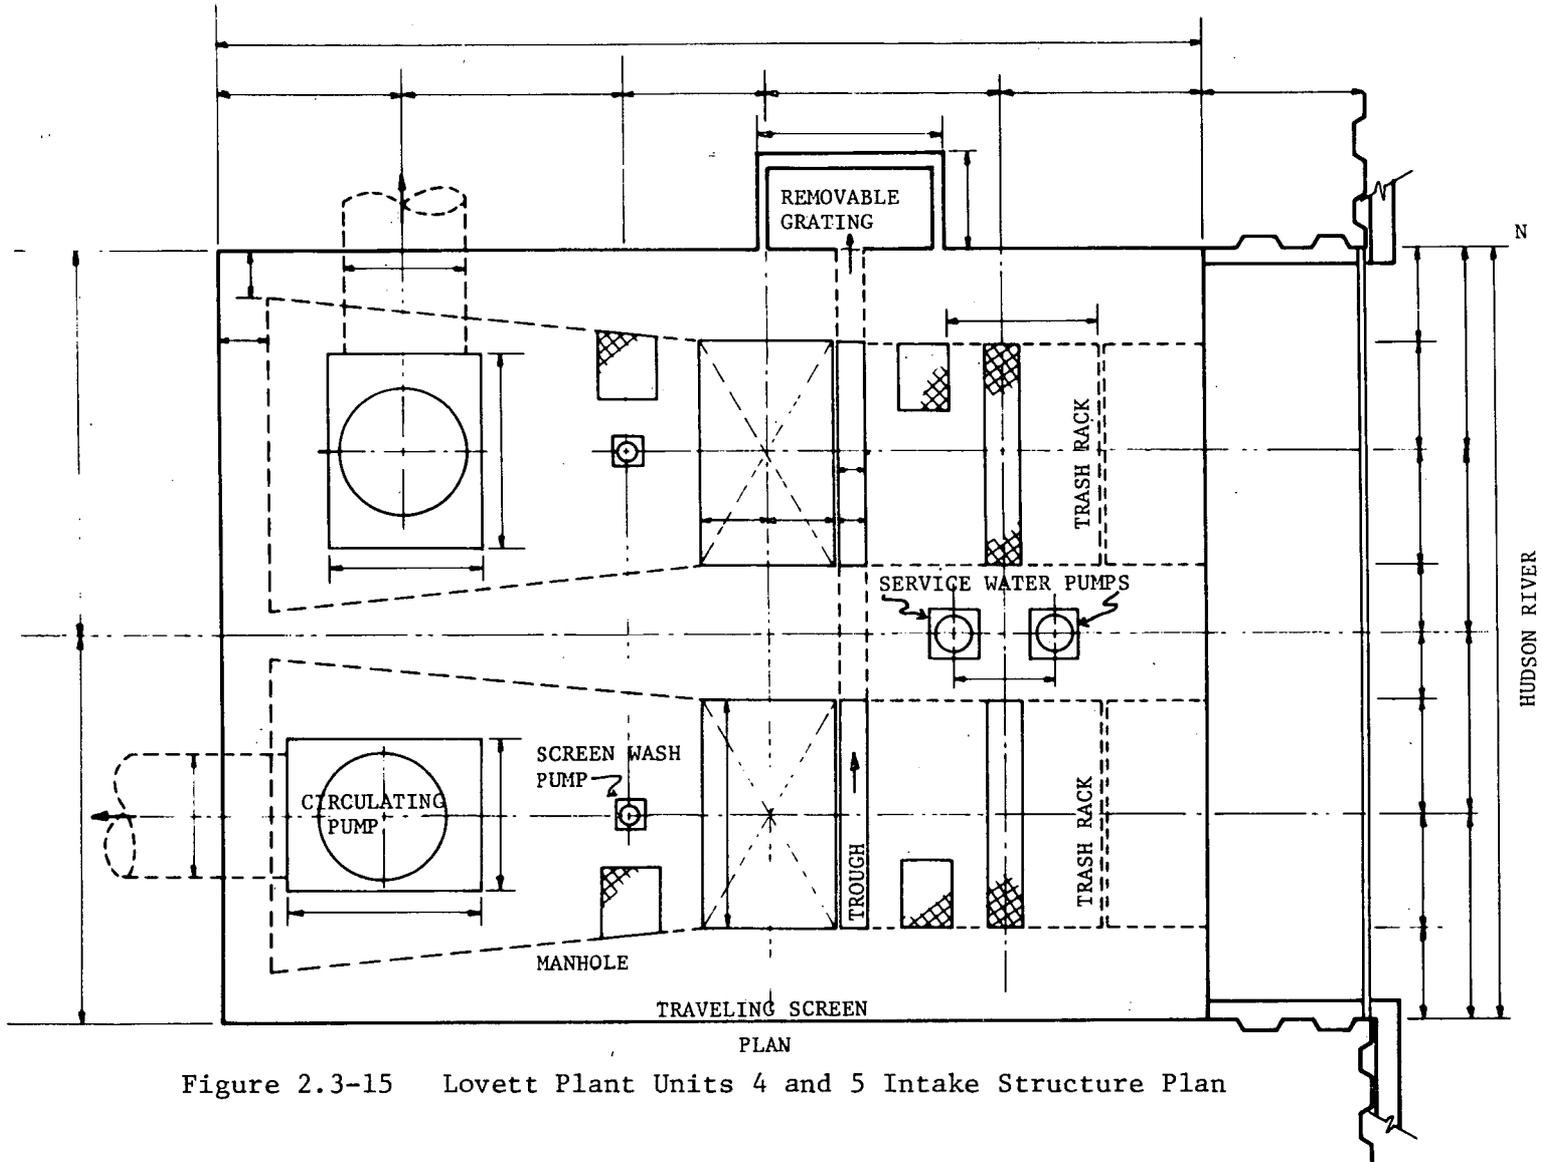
Lovett Plant Units 4 and 5 Intake Structure Plan
